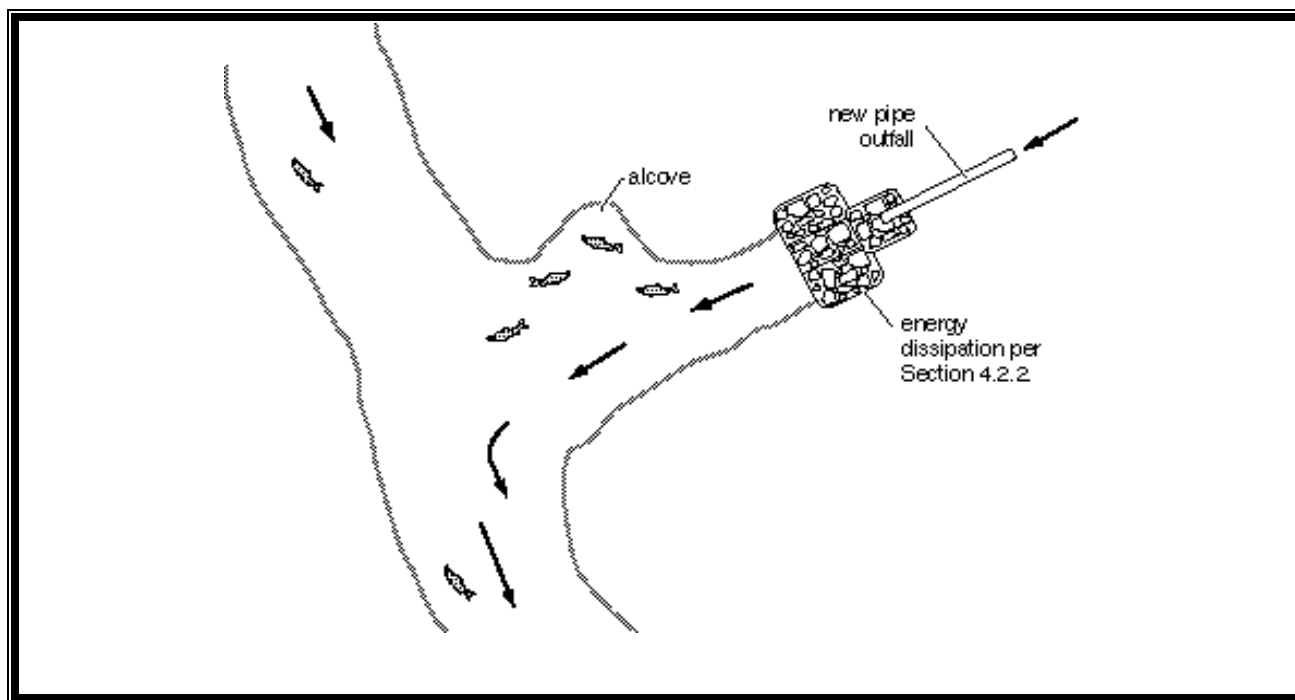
Fish Habitat Improvement at New Outfalls.
